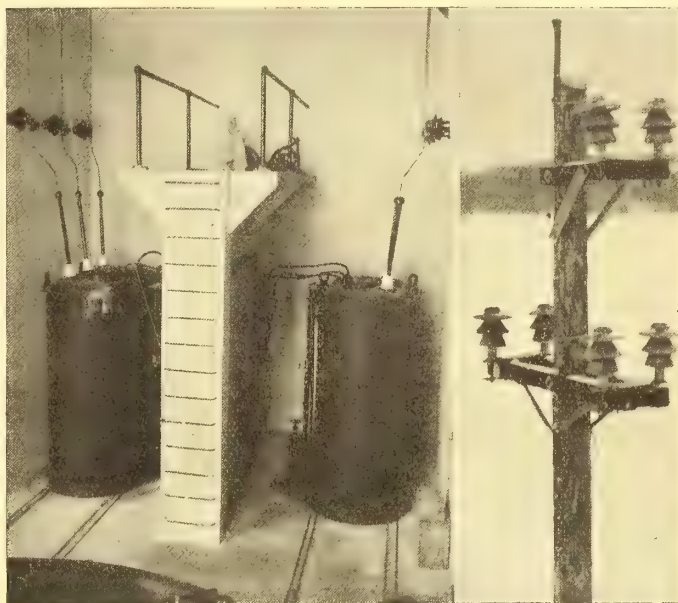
The Transformers run on Rails Set in the Concrete Floor
